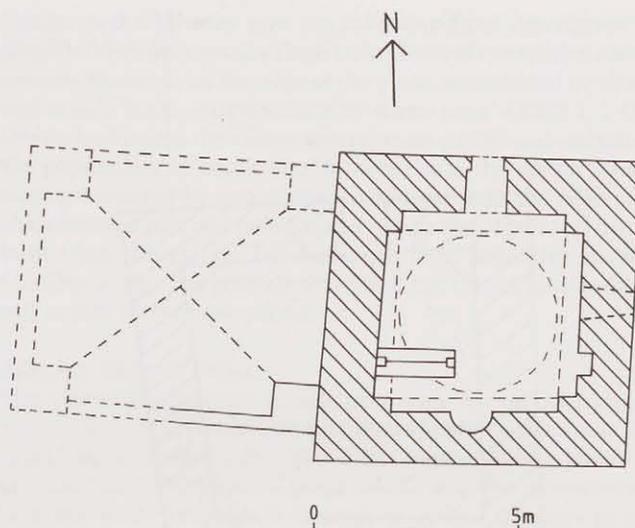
Shaykh Şandāhāwī (No. 134). Plan of shrine.
